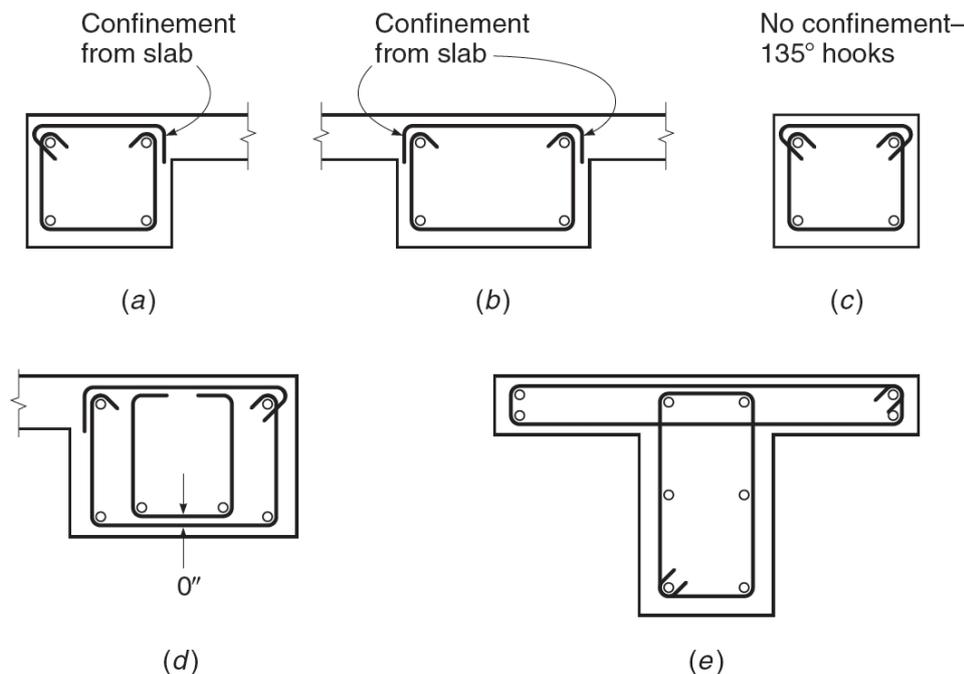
Stirrup-ties and longitudinal reinforcement for torsion: (a) spandrel beam with flanges on one side; (b) interior beam; (c) isolated rectangular beam; (d) wide spandrel beam; and (e) T beam with torsional reinforcement in flanges.
